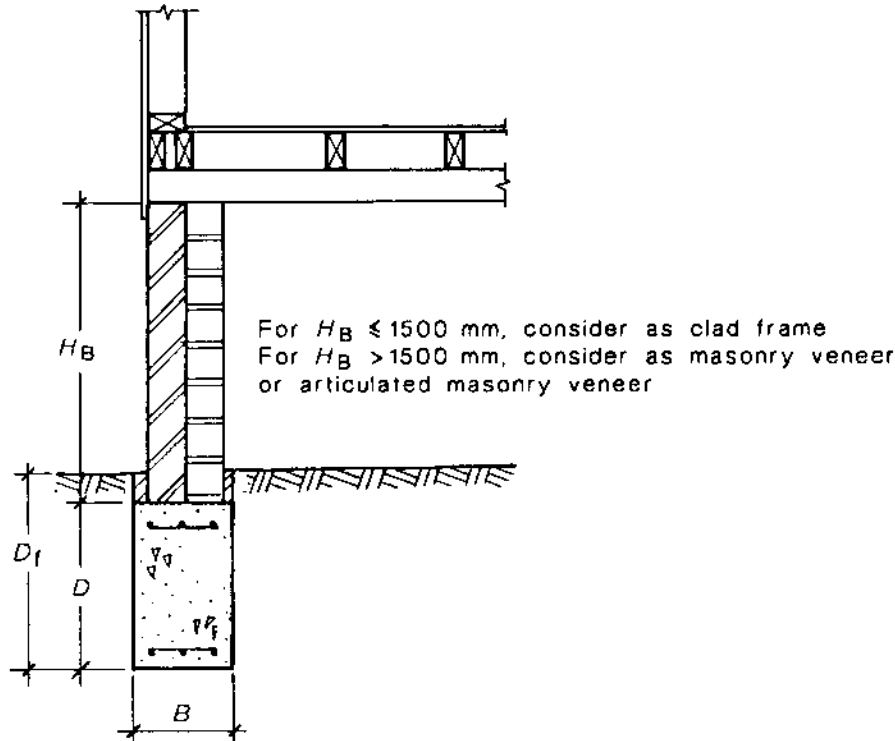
STRIP FOOTING SYSTEMS, CLAD FRAME
